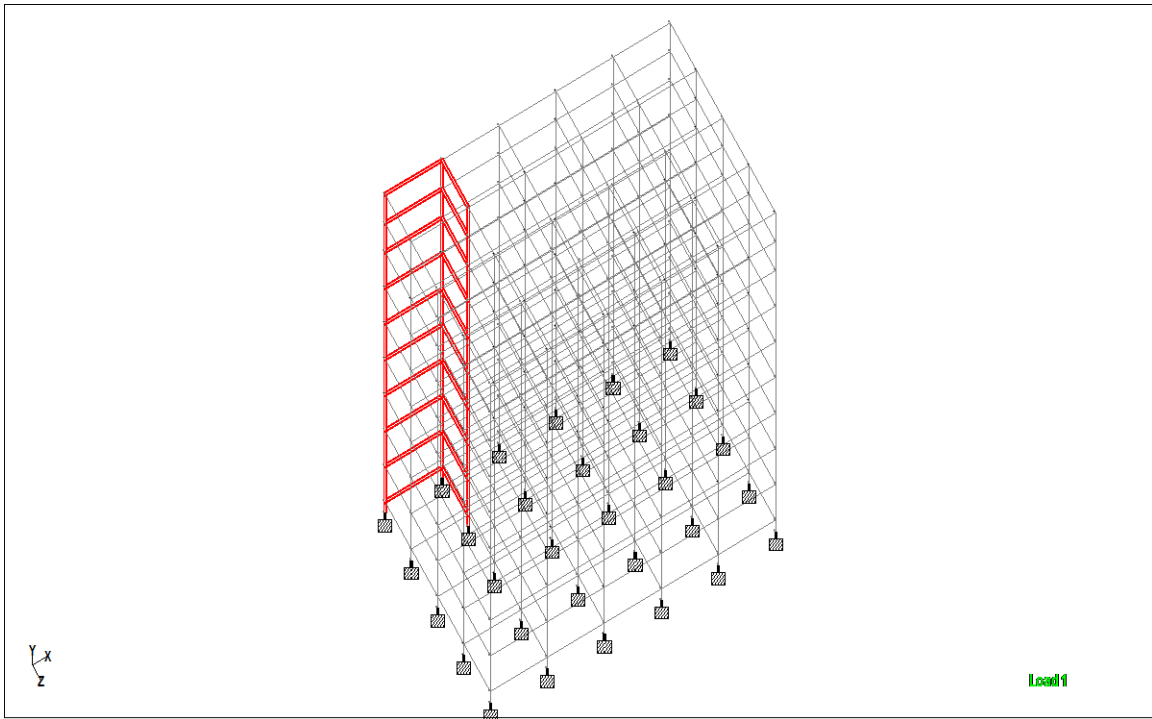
Corner, Peripheral & Centre Column & its Connecting Beam
